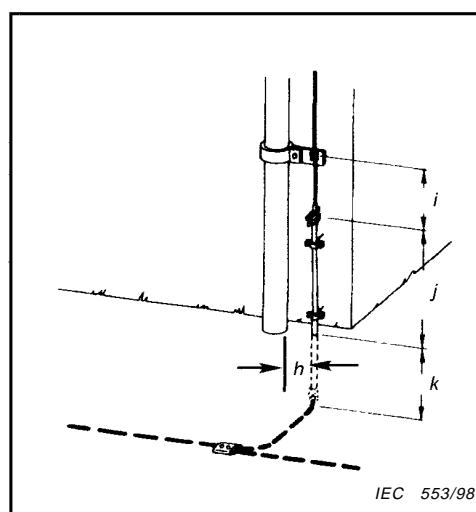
Construction of a test joint in a down-conductor and bonding to a drain-pipe
